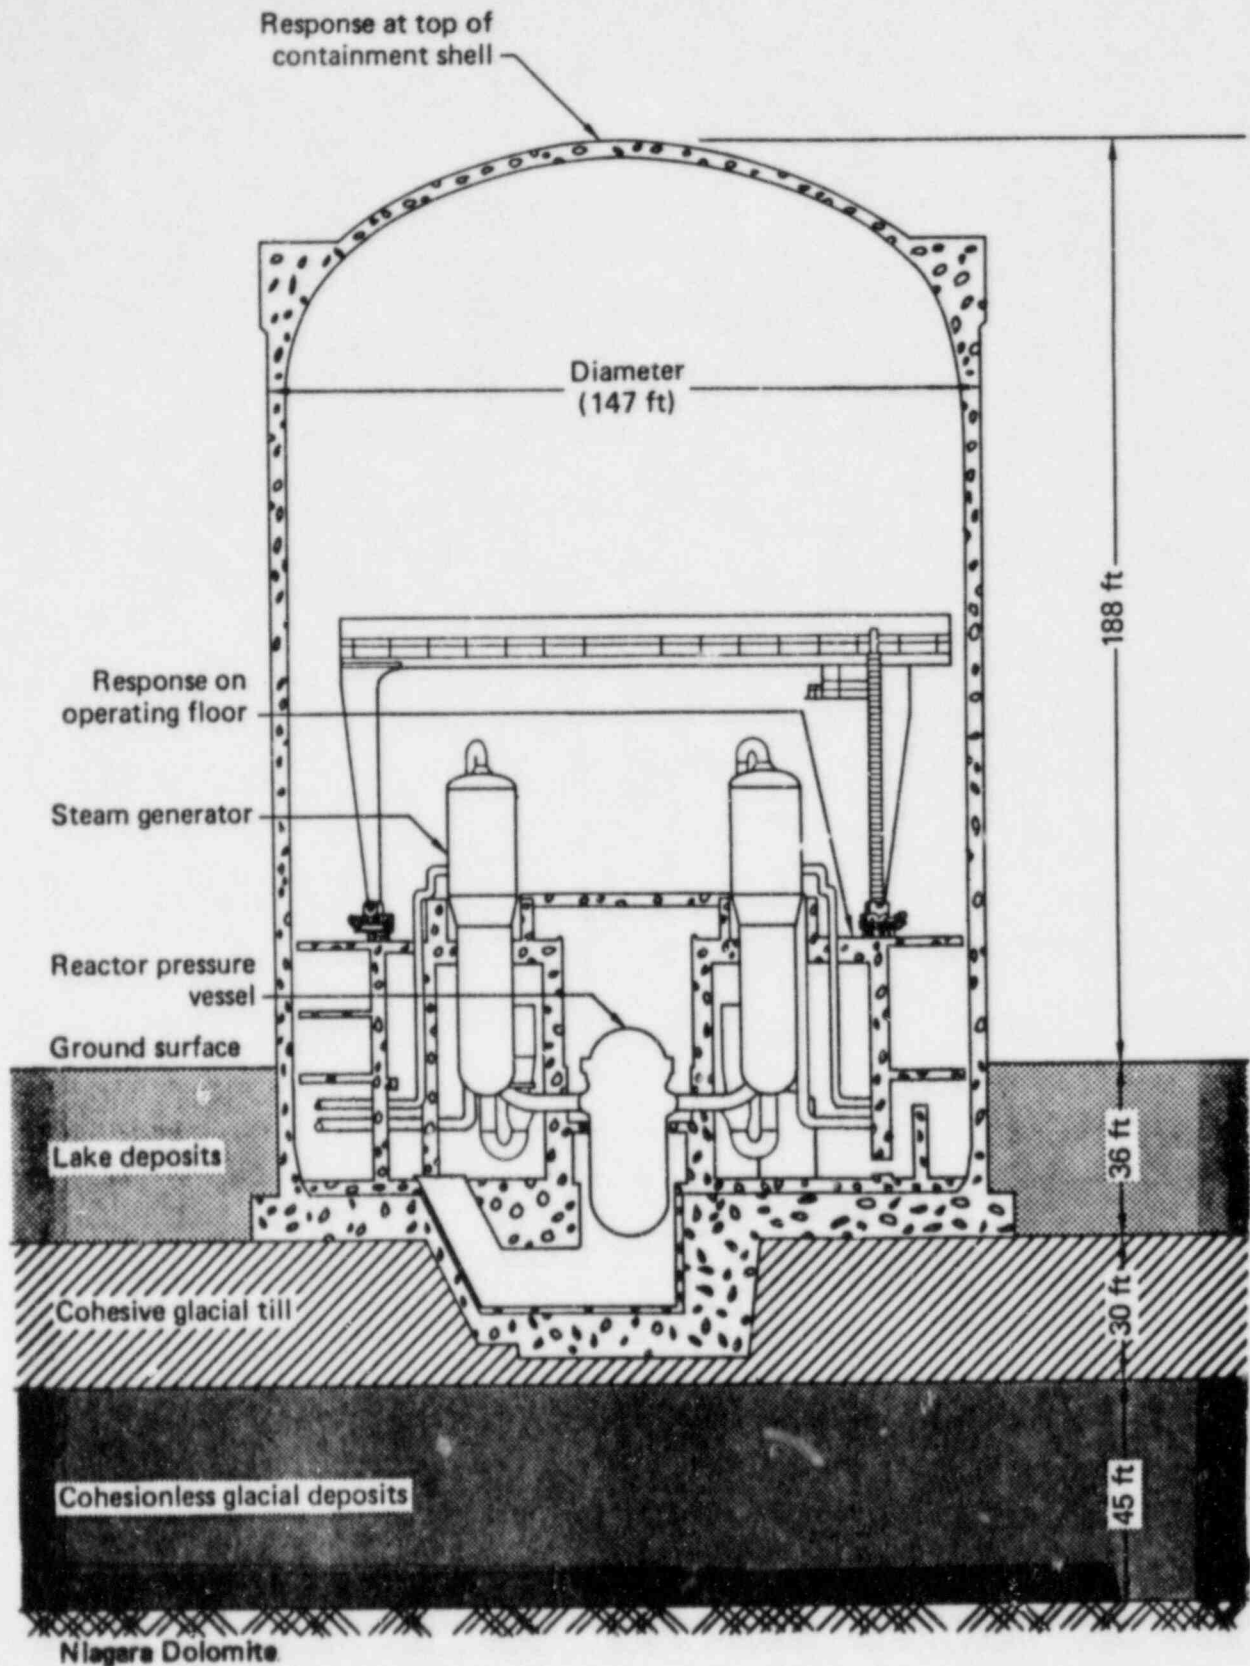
Simplified elevation view of Unit 1 Reactor Building, facing west.
